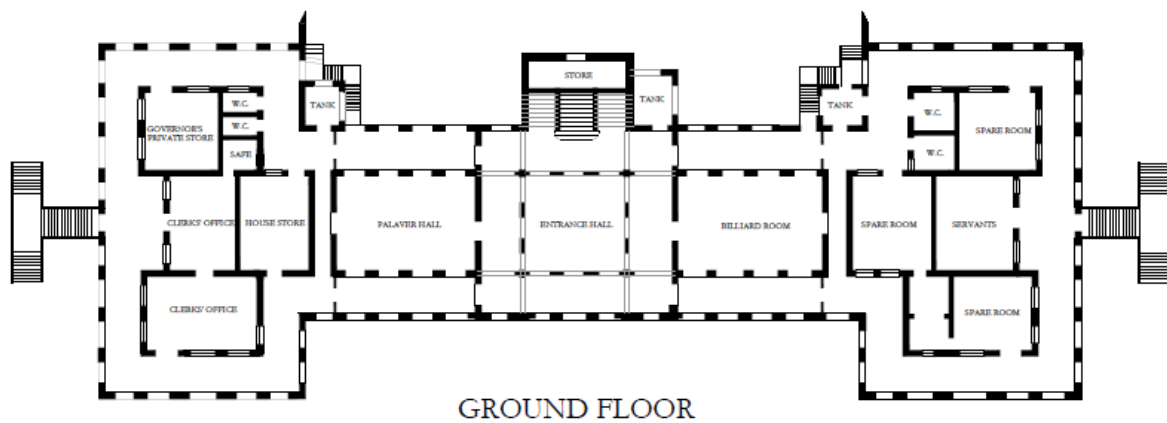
1889 ground floor plan of proposed new Lagos government house<sup>376</sup>
